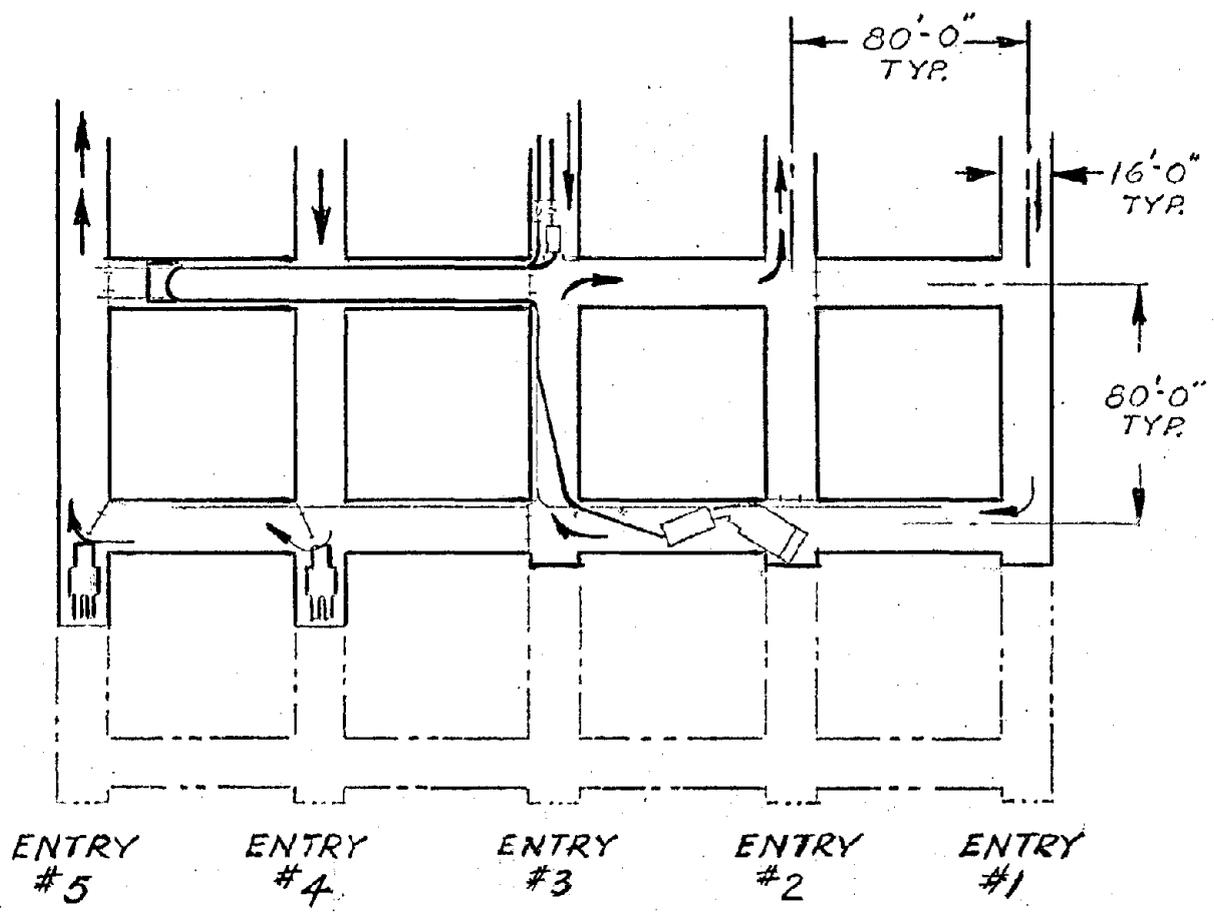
Mine Plan; First Cut in Entry No. 2
